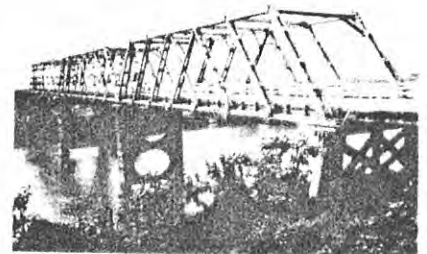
Percy Allan (1861-1930), "Mr Timber Truss Bridge", is synonymous with timber construction. He joined the Public Works Department in 1878 and became a competent and innovative bridge designer. Probably his best known bridges are the electrically operated swing spans at Pyrmont and Glebe Island. His 1894 designs of the pony truss (above) and overhead-braced trusses (right) bear his name.
